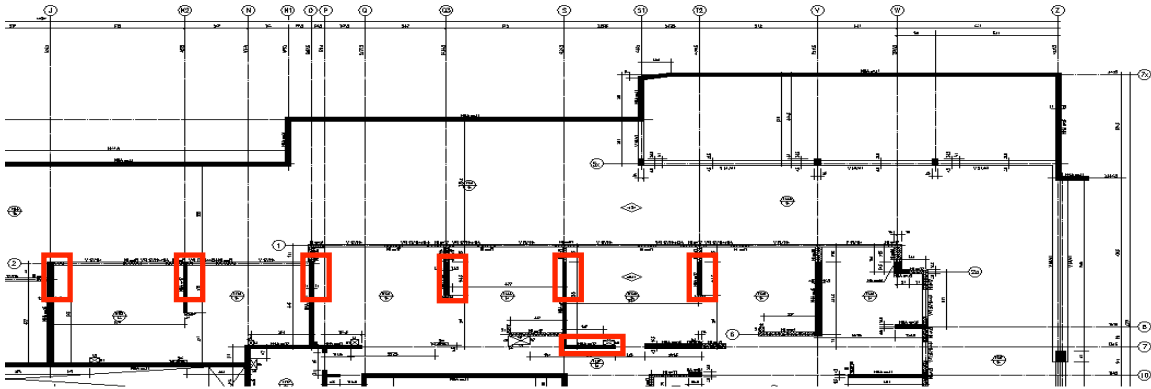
Emerald building (Santiago-Chile) – Damaged walls in the first subterranean level.
